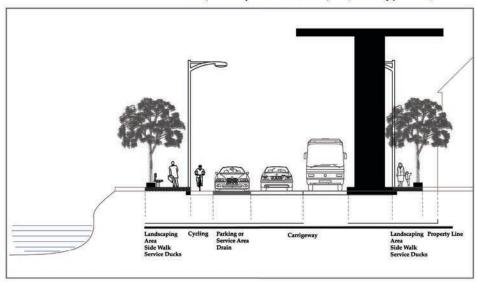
Cross section of a Level 01 - General Water Drive (With a parallel LRT line) - (Road Type - 1–A)
